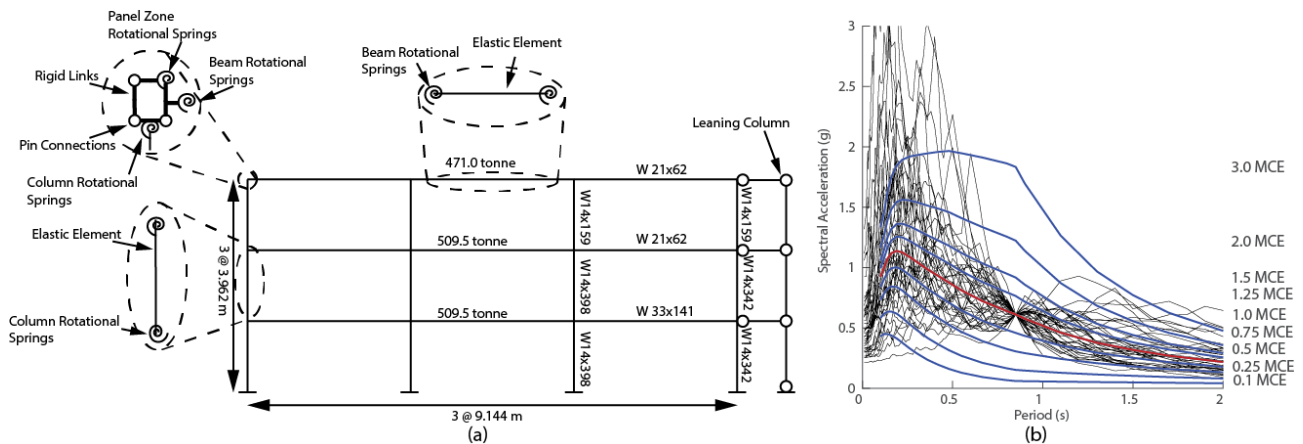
(a) Elevation view and modeling details of seismic force-resisting system of three-story steel office type archetype building, (b) Conditional spectra for archetype building
